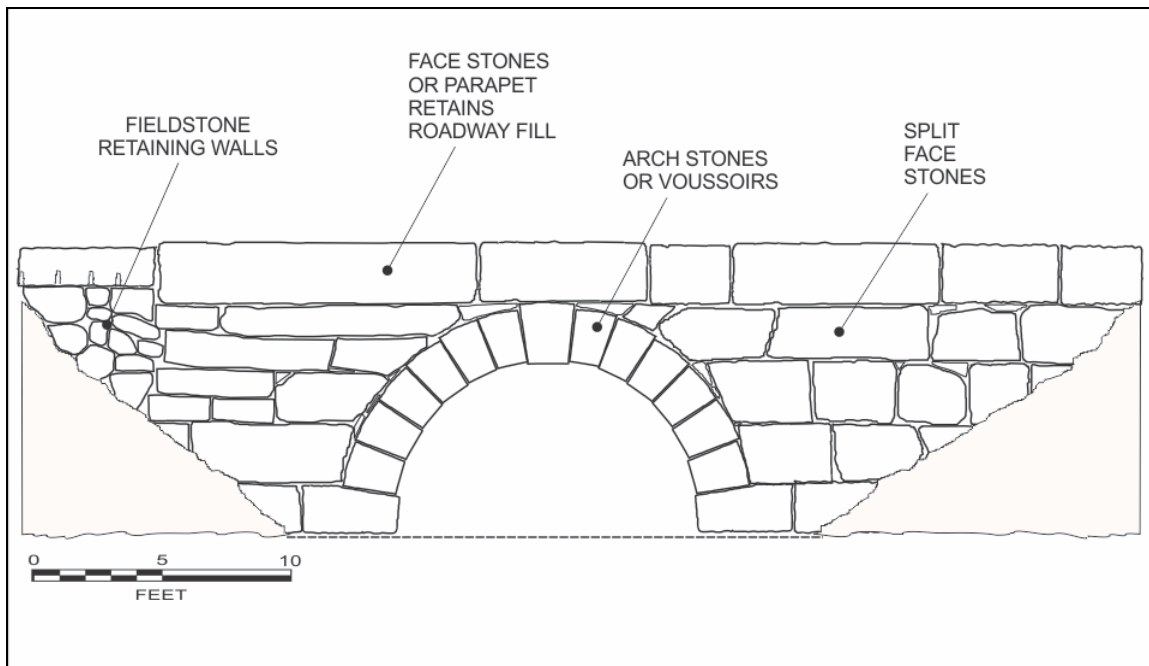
Typical stone arch culvert with semi-circular arch of split and cut quarry stone.
